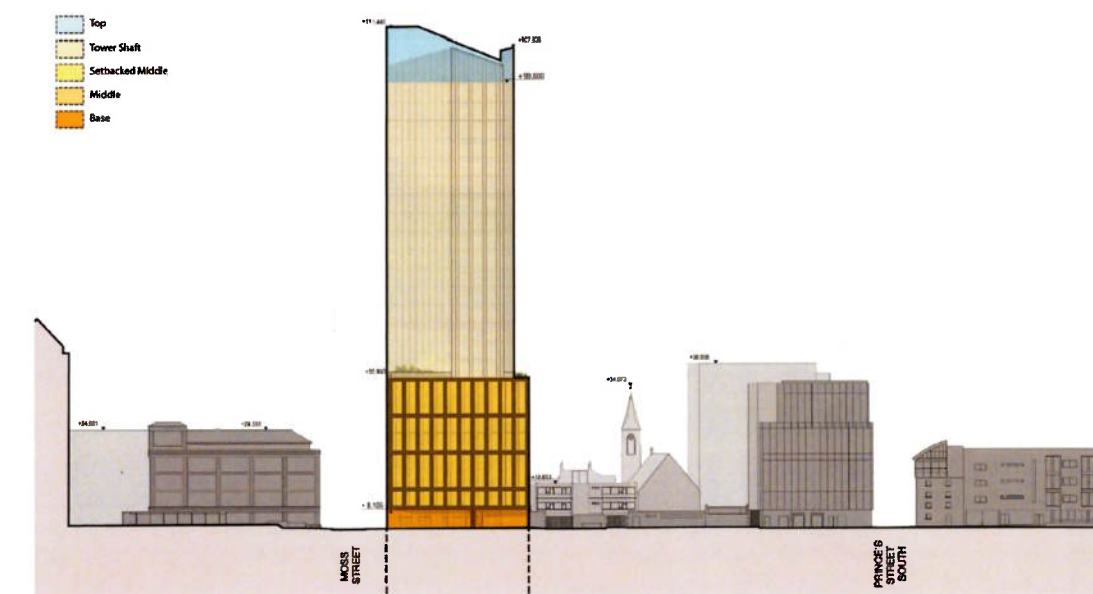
Elevation of Proposed Building's Mid Section from Gloucester Street
